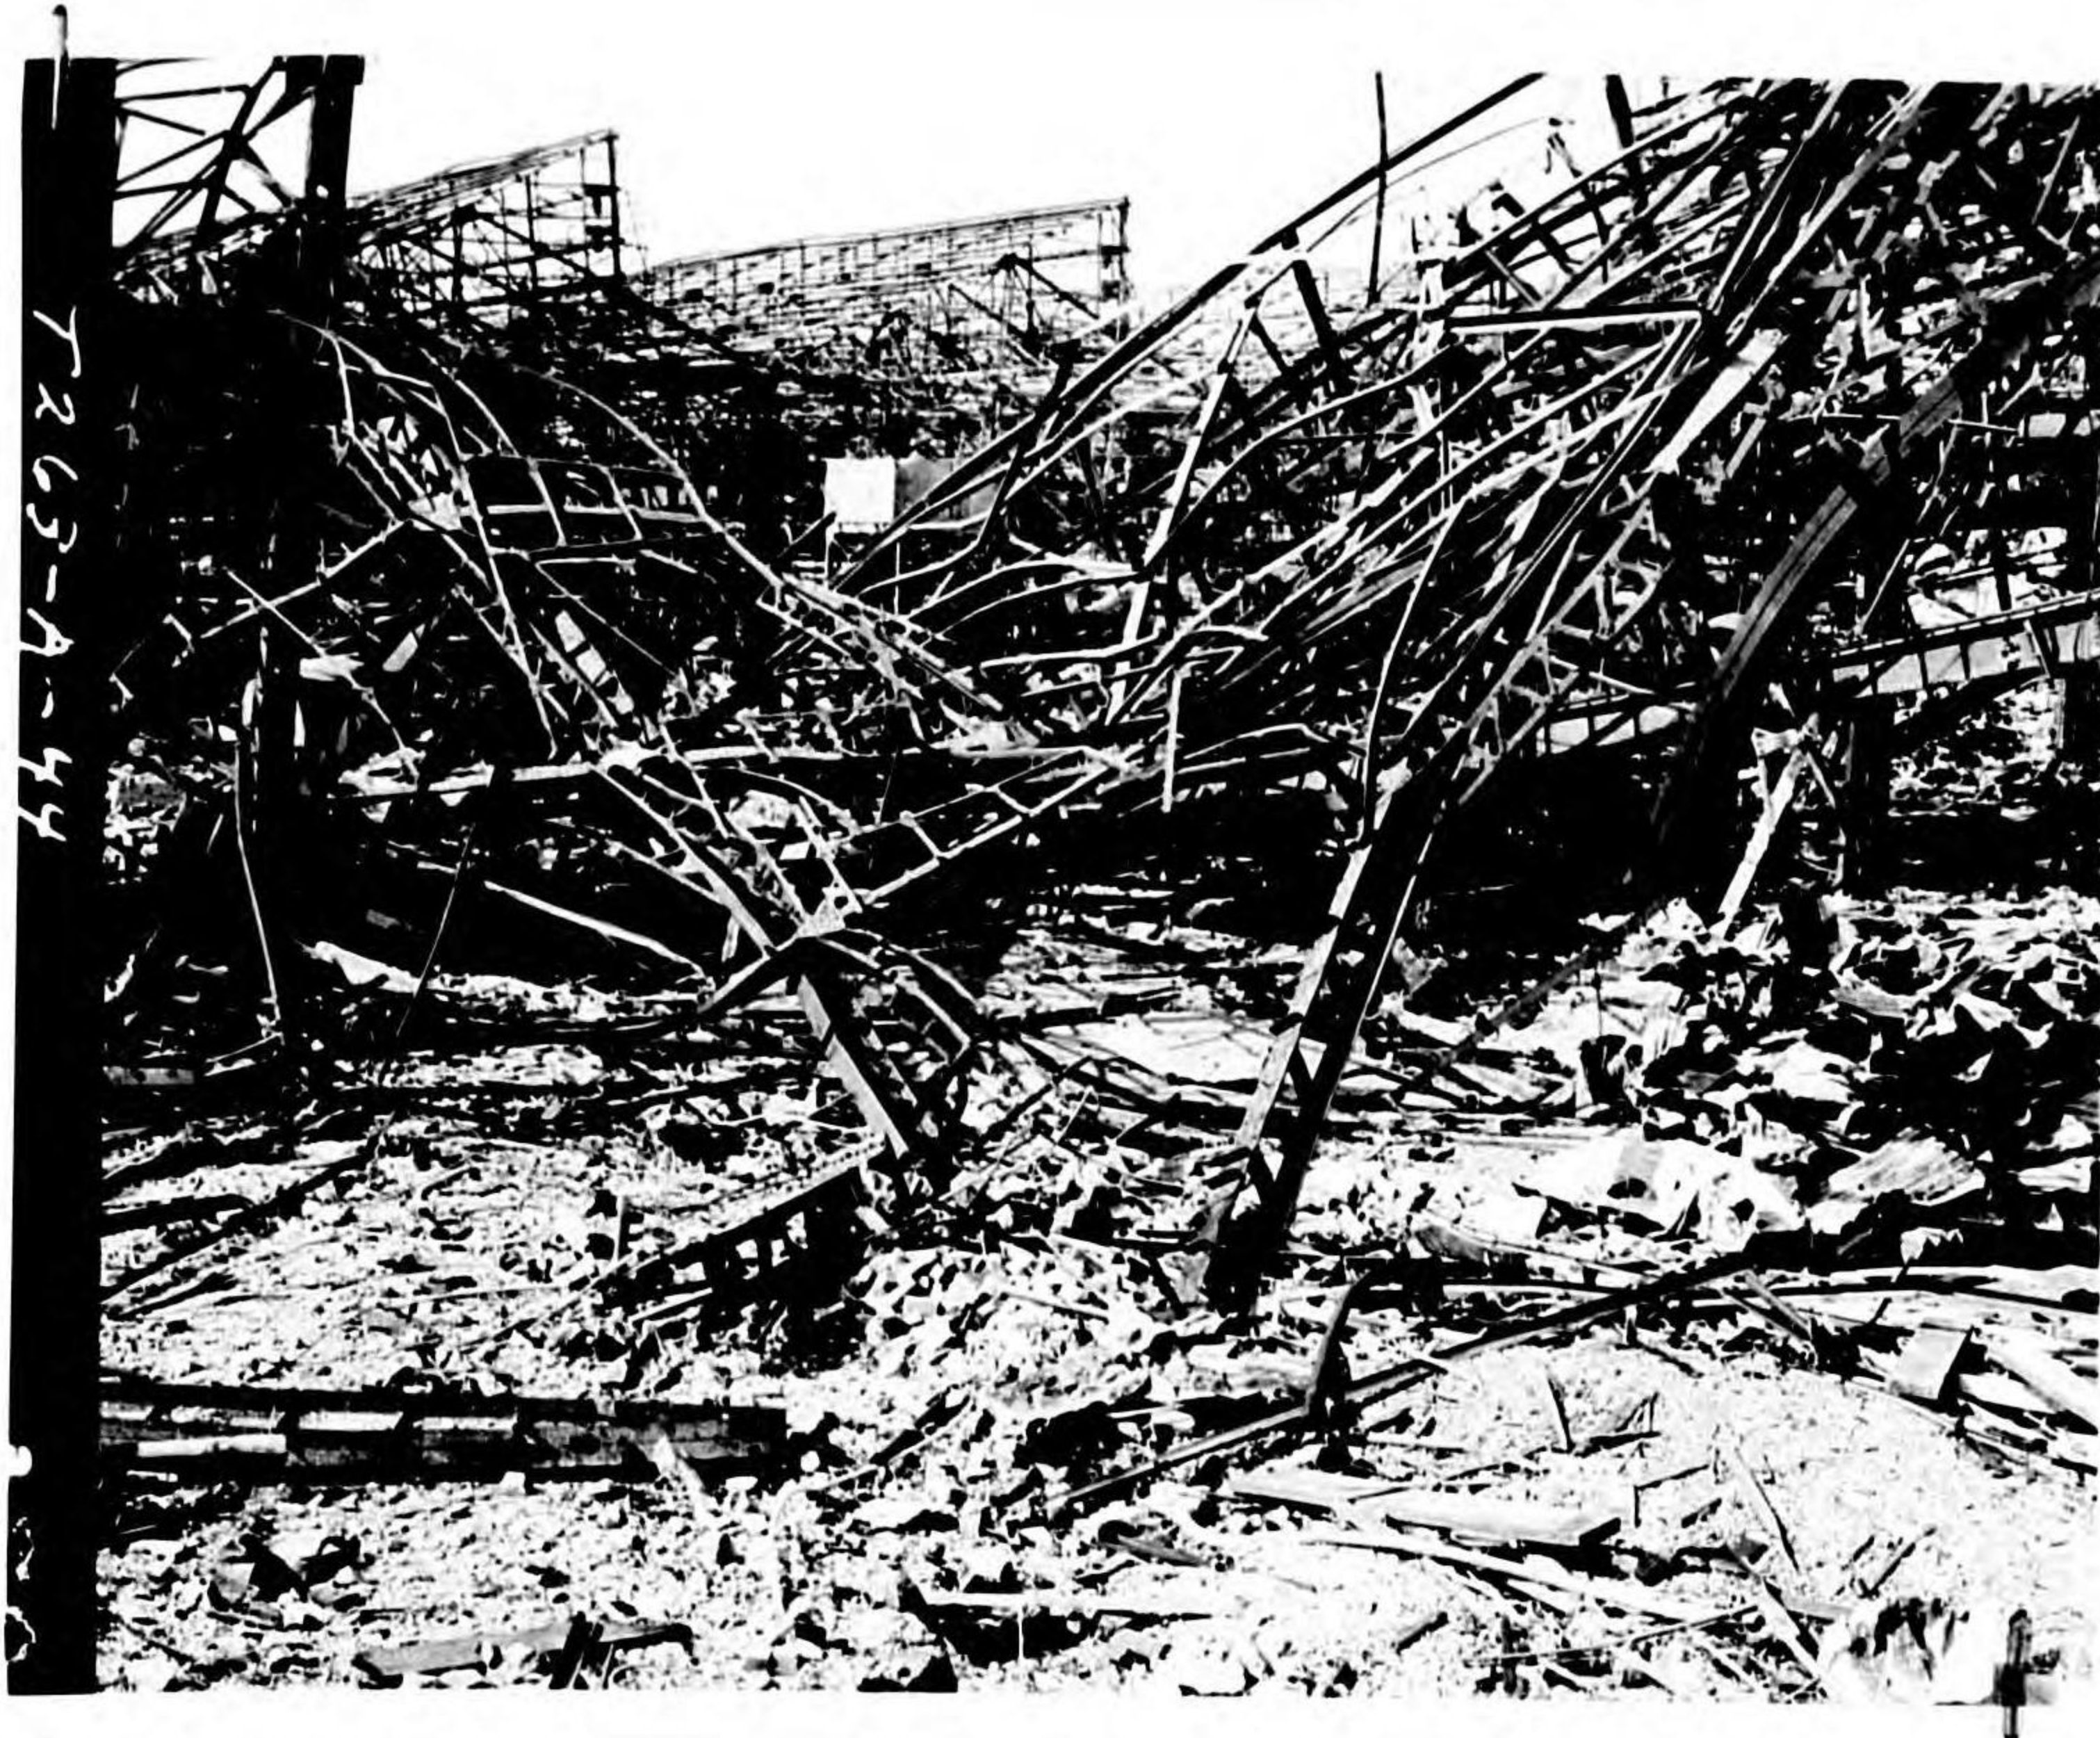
Bldg. 51, Bomb 66. Blast damage.
